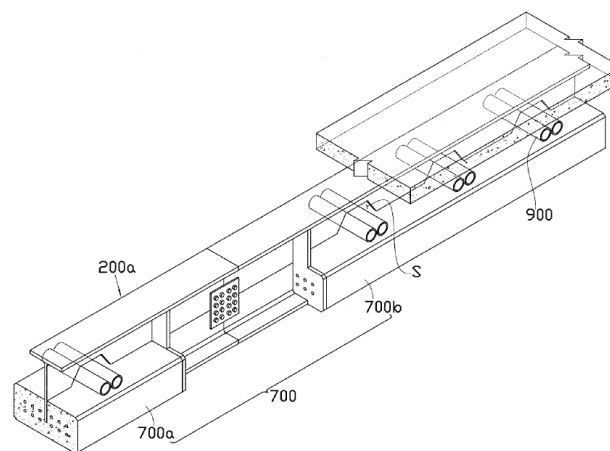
Composite beam with T-Type Steel (Kim, 2011)
